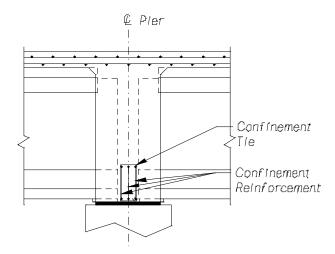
Elevation View Showing Confinement Reinforcement in Pier Diaphragms
